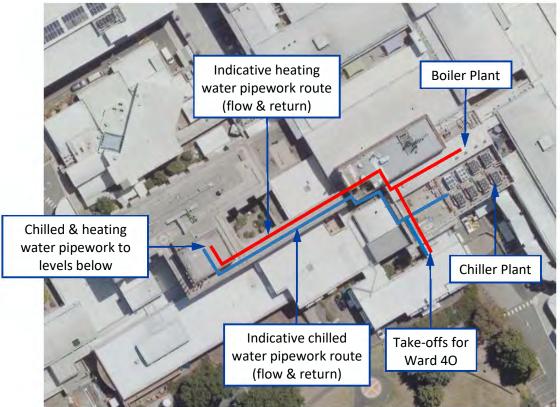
Proposed Chiller & Heating Water Pipework Route
